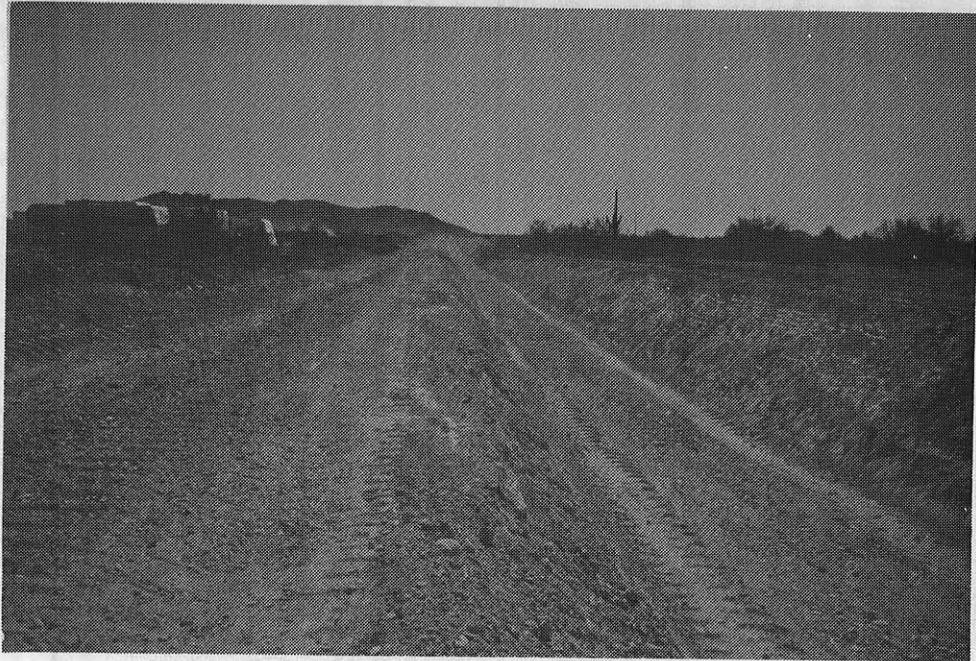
View of dike no.1 completed exploration trench excavation, looking south from station 13+00. Note widespread caliche. February 1984
